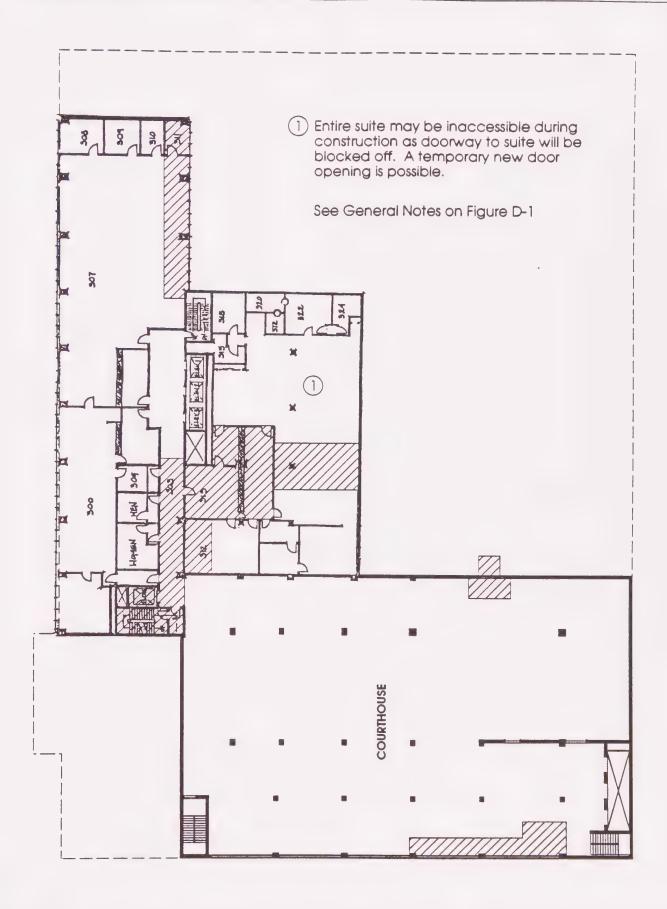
3rd Floor Plan Showing Areas Impacted by Construction
